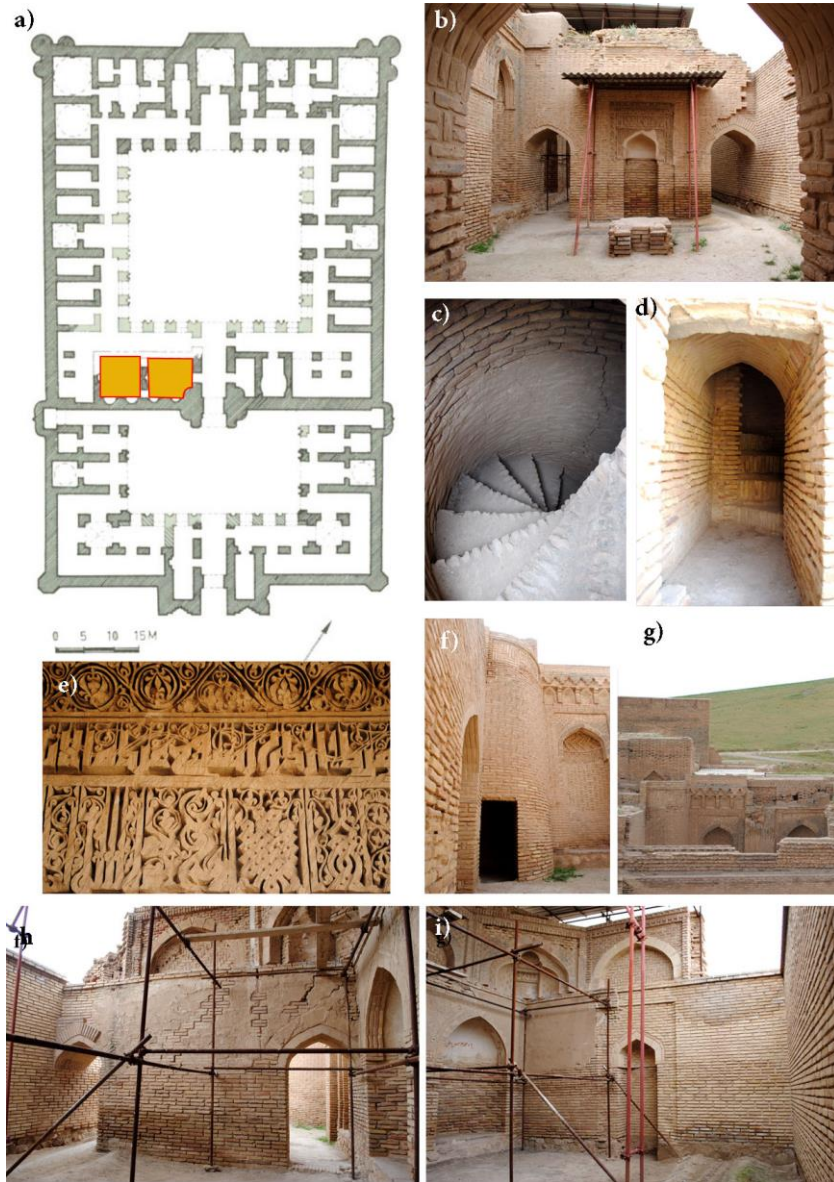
a) plan showing the Masjed of the second courtyard (created by author according the plan (Aslanapa, 1971: 81) b) first praying area and its mihrab c) stairs of the masjid niches d) entrance to the stairs e) detail of the stucco decoration f) cylindric part with the stairs g) view on roof level h) Wall and tromps of the second part i) mihrab nish and trompes of the second part (Created by author, 2012)
